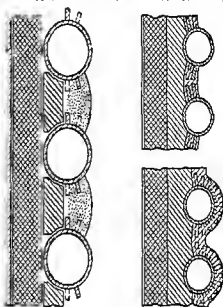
Typical details of waterwalls of sectional header boiler furnaces—left, Combustion Engineering; right, Babcock and Wilcox.
